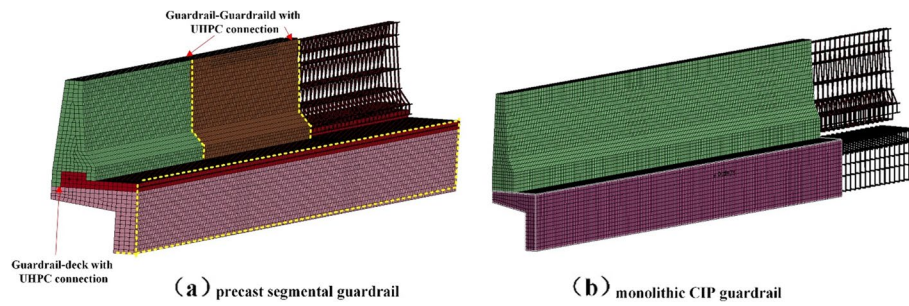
Prefabricated segmental guardrail with UHPC connection model
